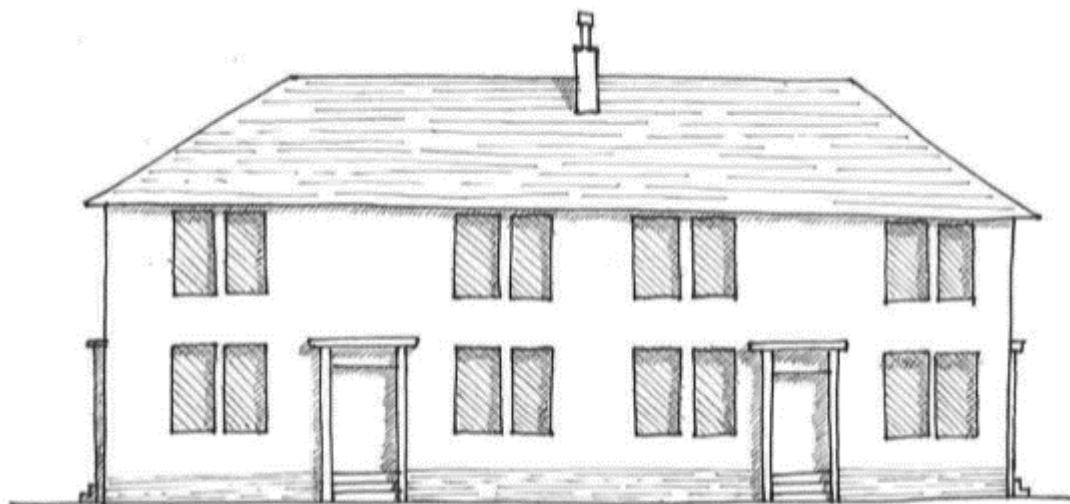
A typical four-in-a-block cottage, with rectangular plan and hipped roof (EAC DP&R¹).
